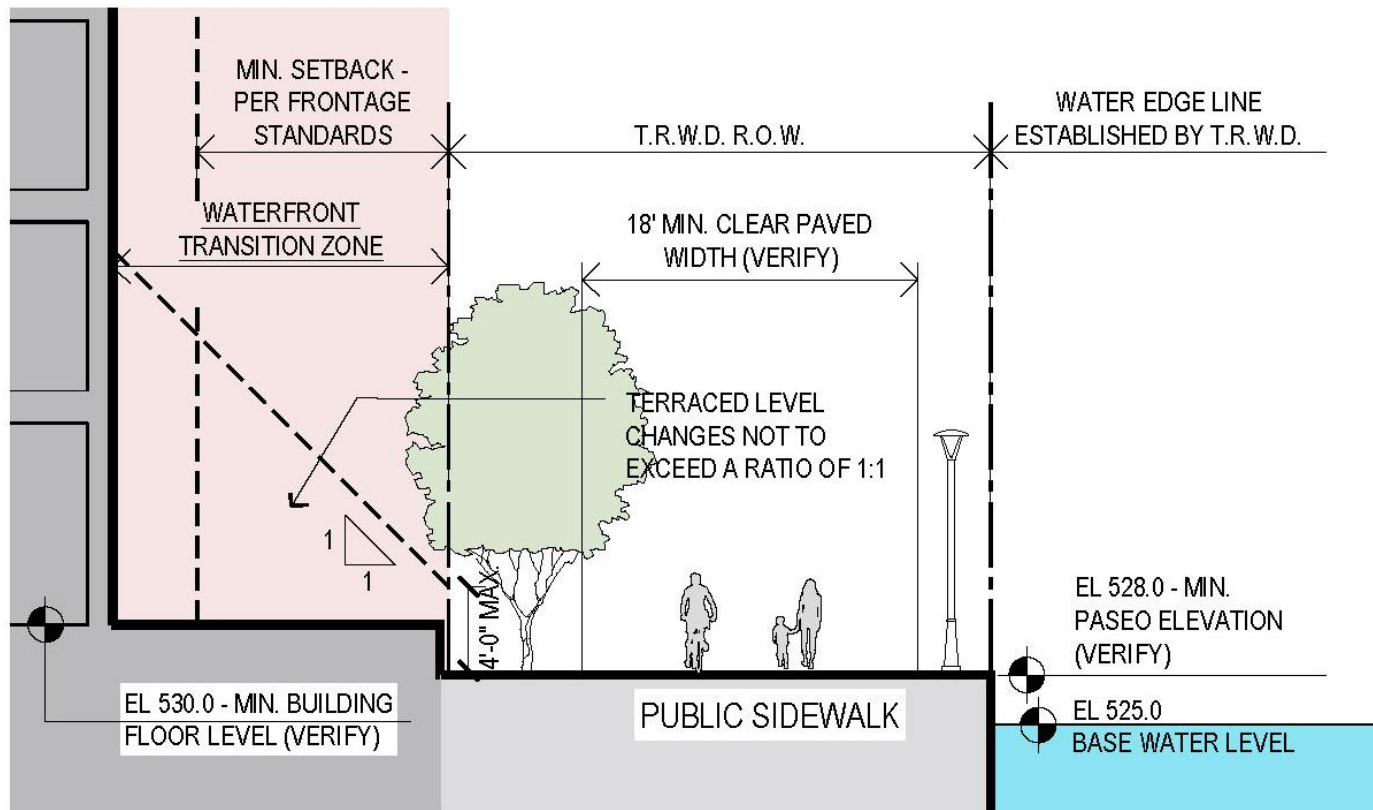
Illustrative section through the canal and the Waterfront Transition Zone (WTZ). The WTZ is shown as a stepped landscape intended to provide a visual connection between the canal and the adjacent buildings, and to enhance public safety along the canal paseo.
